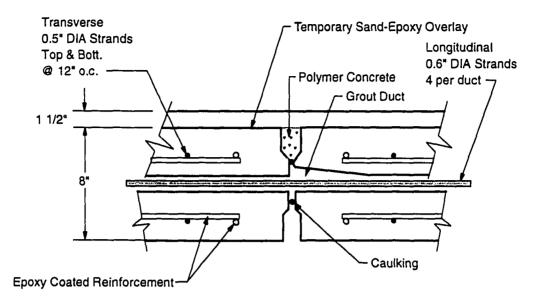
Joint section details, Woodrow Wilson Memorial Bridge.
